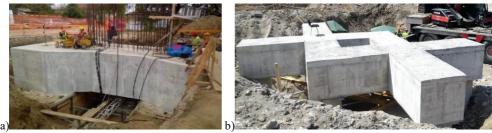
SLT - reactive system: a) bridge at Ostružnica across the Sava river in Serbia (reactive system formed of reinforced concrete beam and of four reinforced concrete piles), b) office-commercial building-tower Ušće in Serbia (reactive system formed of reinforced concrete XX supports and six reinforced concrete piles)
